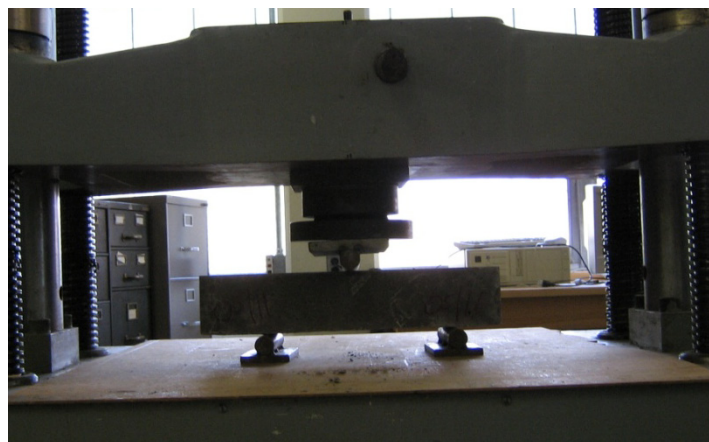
Set-up used for splitting of the substrate concrete specimen for freeze-thaw testing
